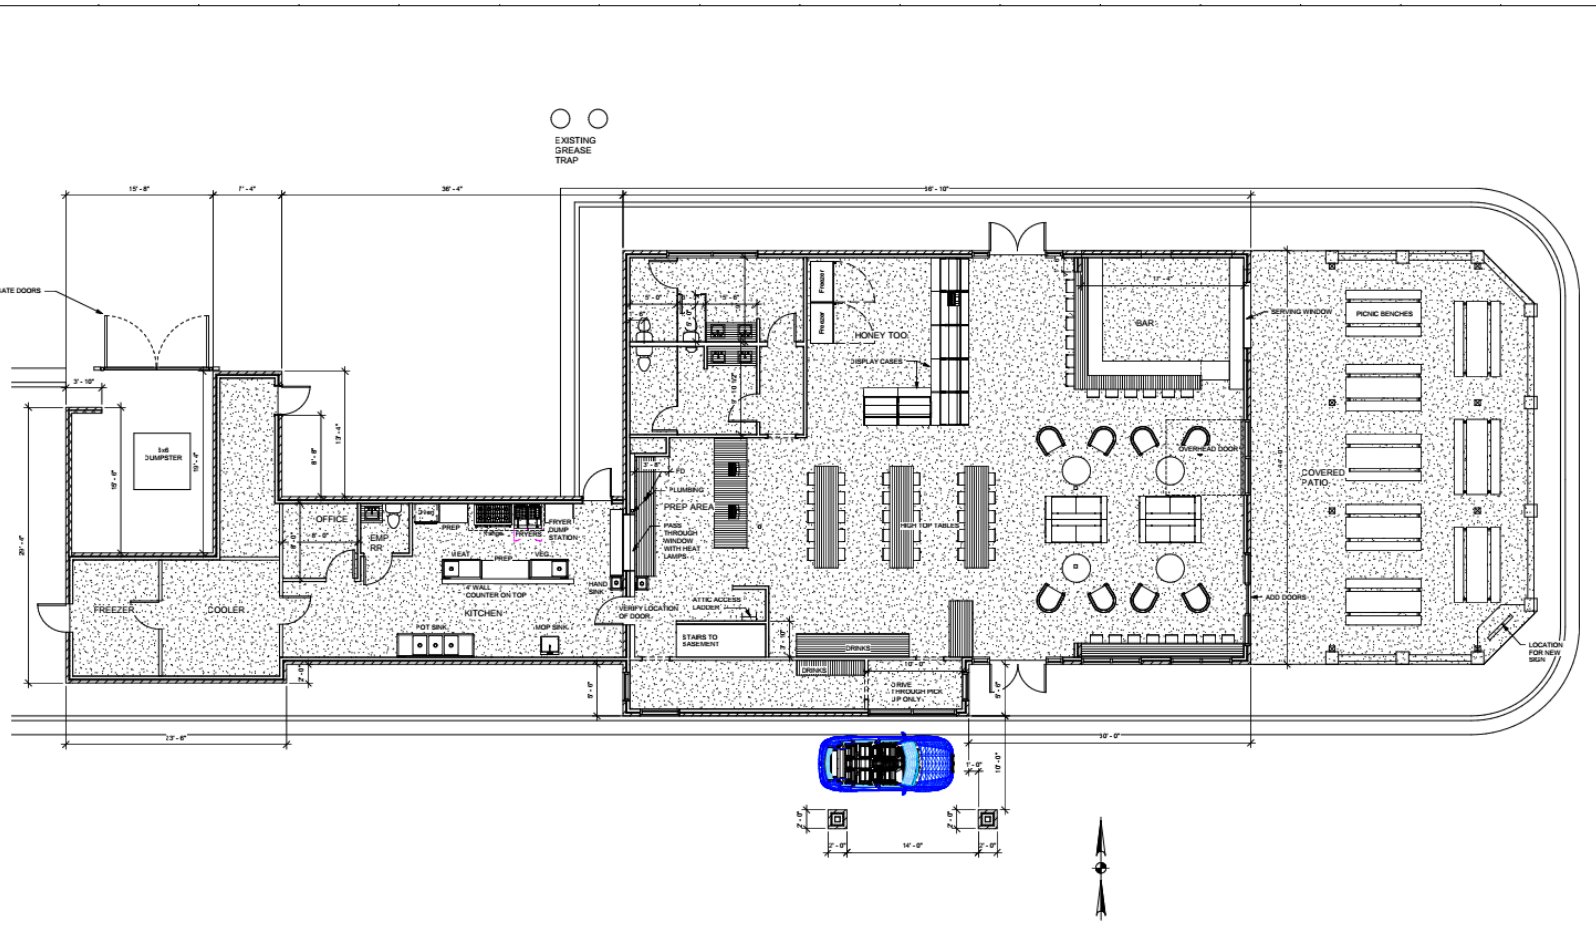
EXHIBIT E: Proposed Architectural Rendering and Floor Plan
